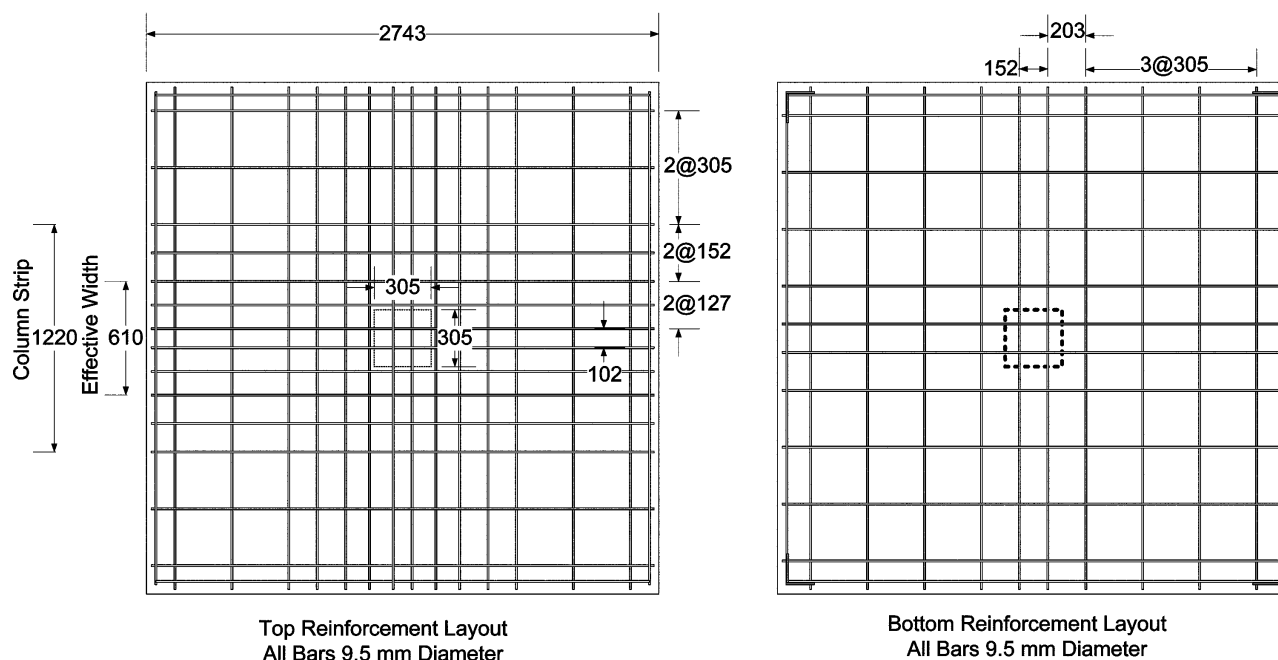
Slab reinforcement layout. (Note: 1 mm = 0.0394 in.)
